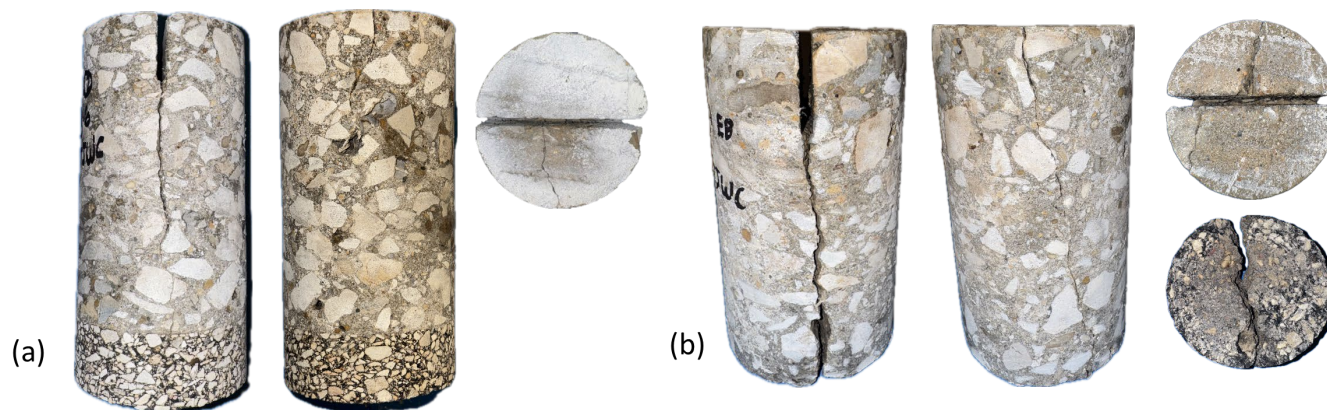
Photo. Examples of cores from transverse joints with longitudinal cracking. (a) Complete joint activation and partial longitudinal crack activation with bonded HMA layer. (b) Core with full-depth activation of both the longitudinal crack and joint but completely unbonded from the HMA interlayer. Each core is shown in front view (aligned with the transverse joint), side view (aligned with the longitudinal crack), top view, and bottom view (included only when interlayer was unbonded).
